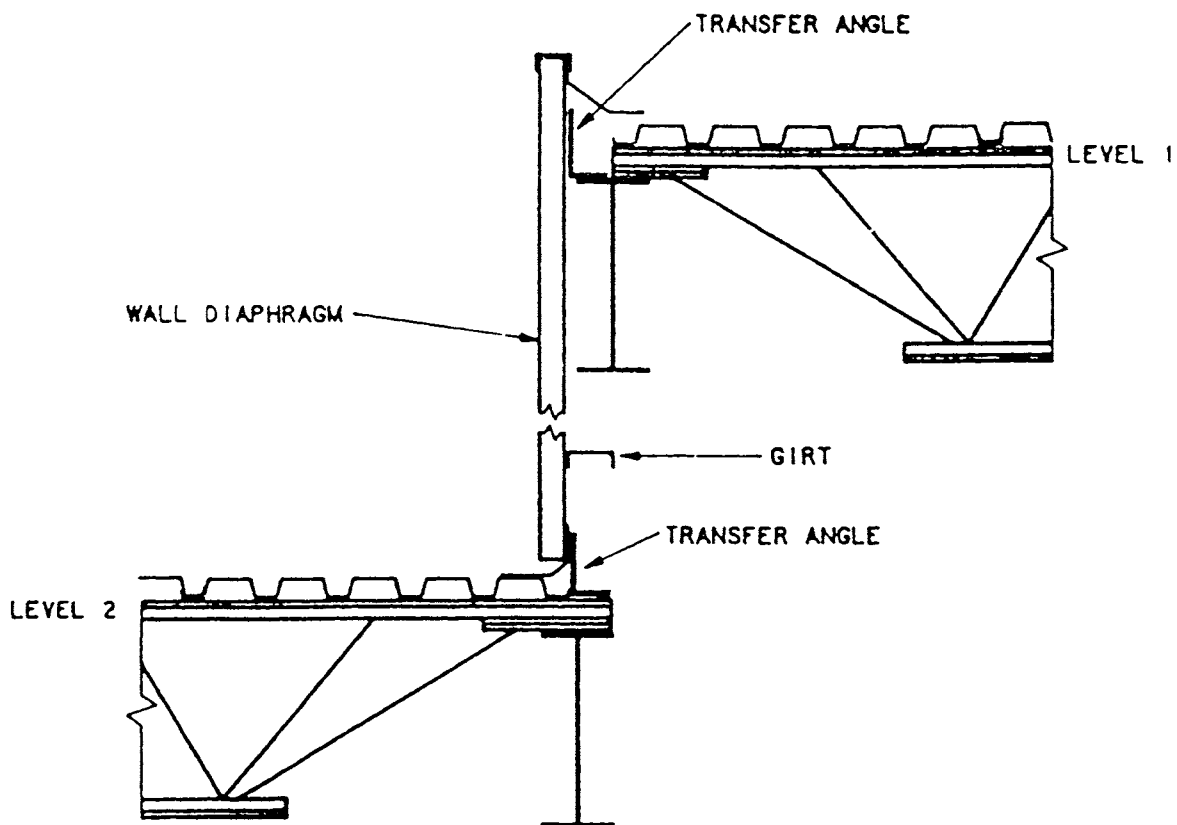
VERTICAL DIAPHRAGM SECTION
